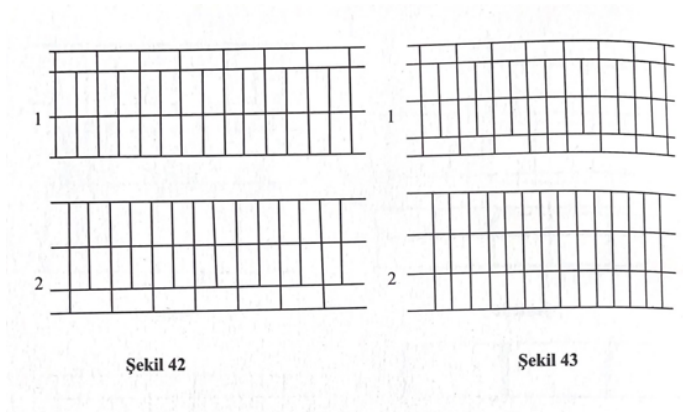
Brick masonry construction techniques (Ali Talat, 2022)
